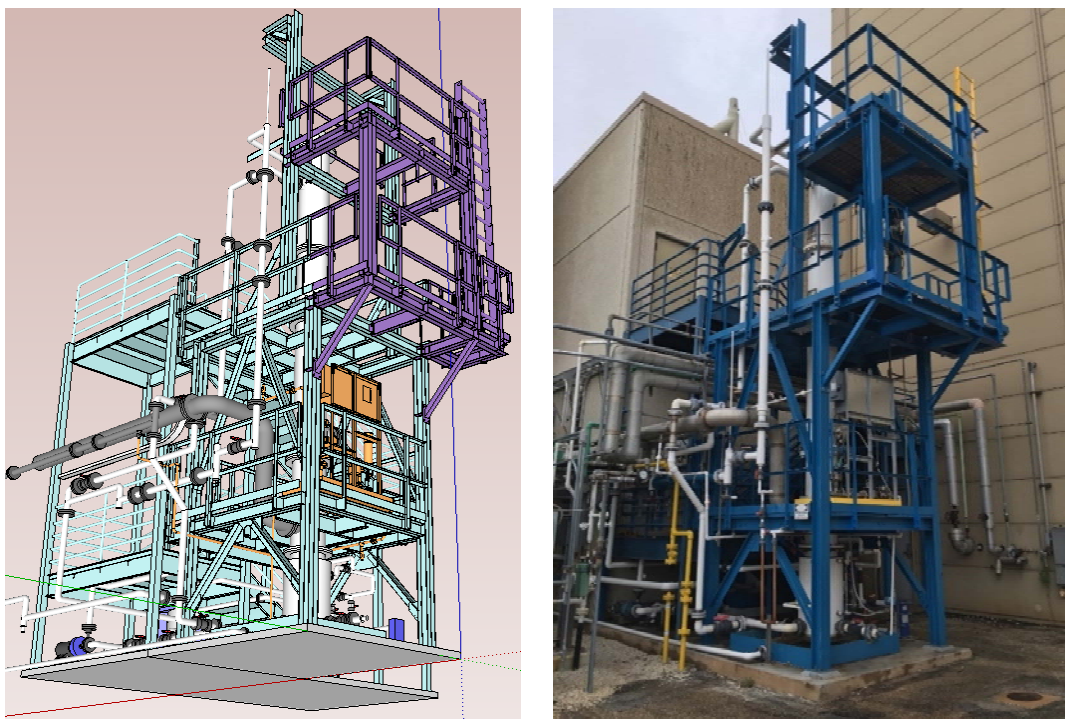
3D drawing and picture of the extension structure (purple part in the 3D drawing) to the PVC column
